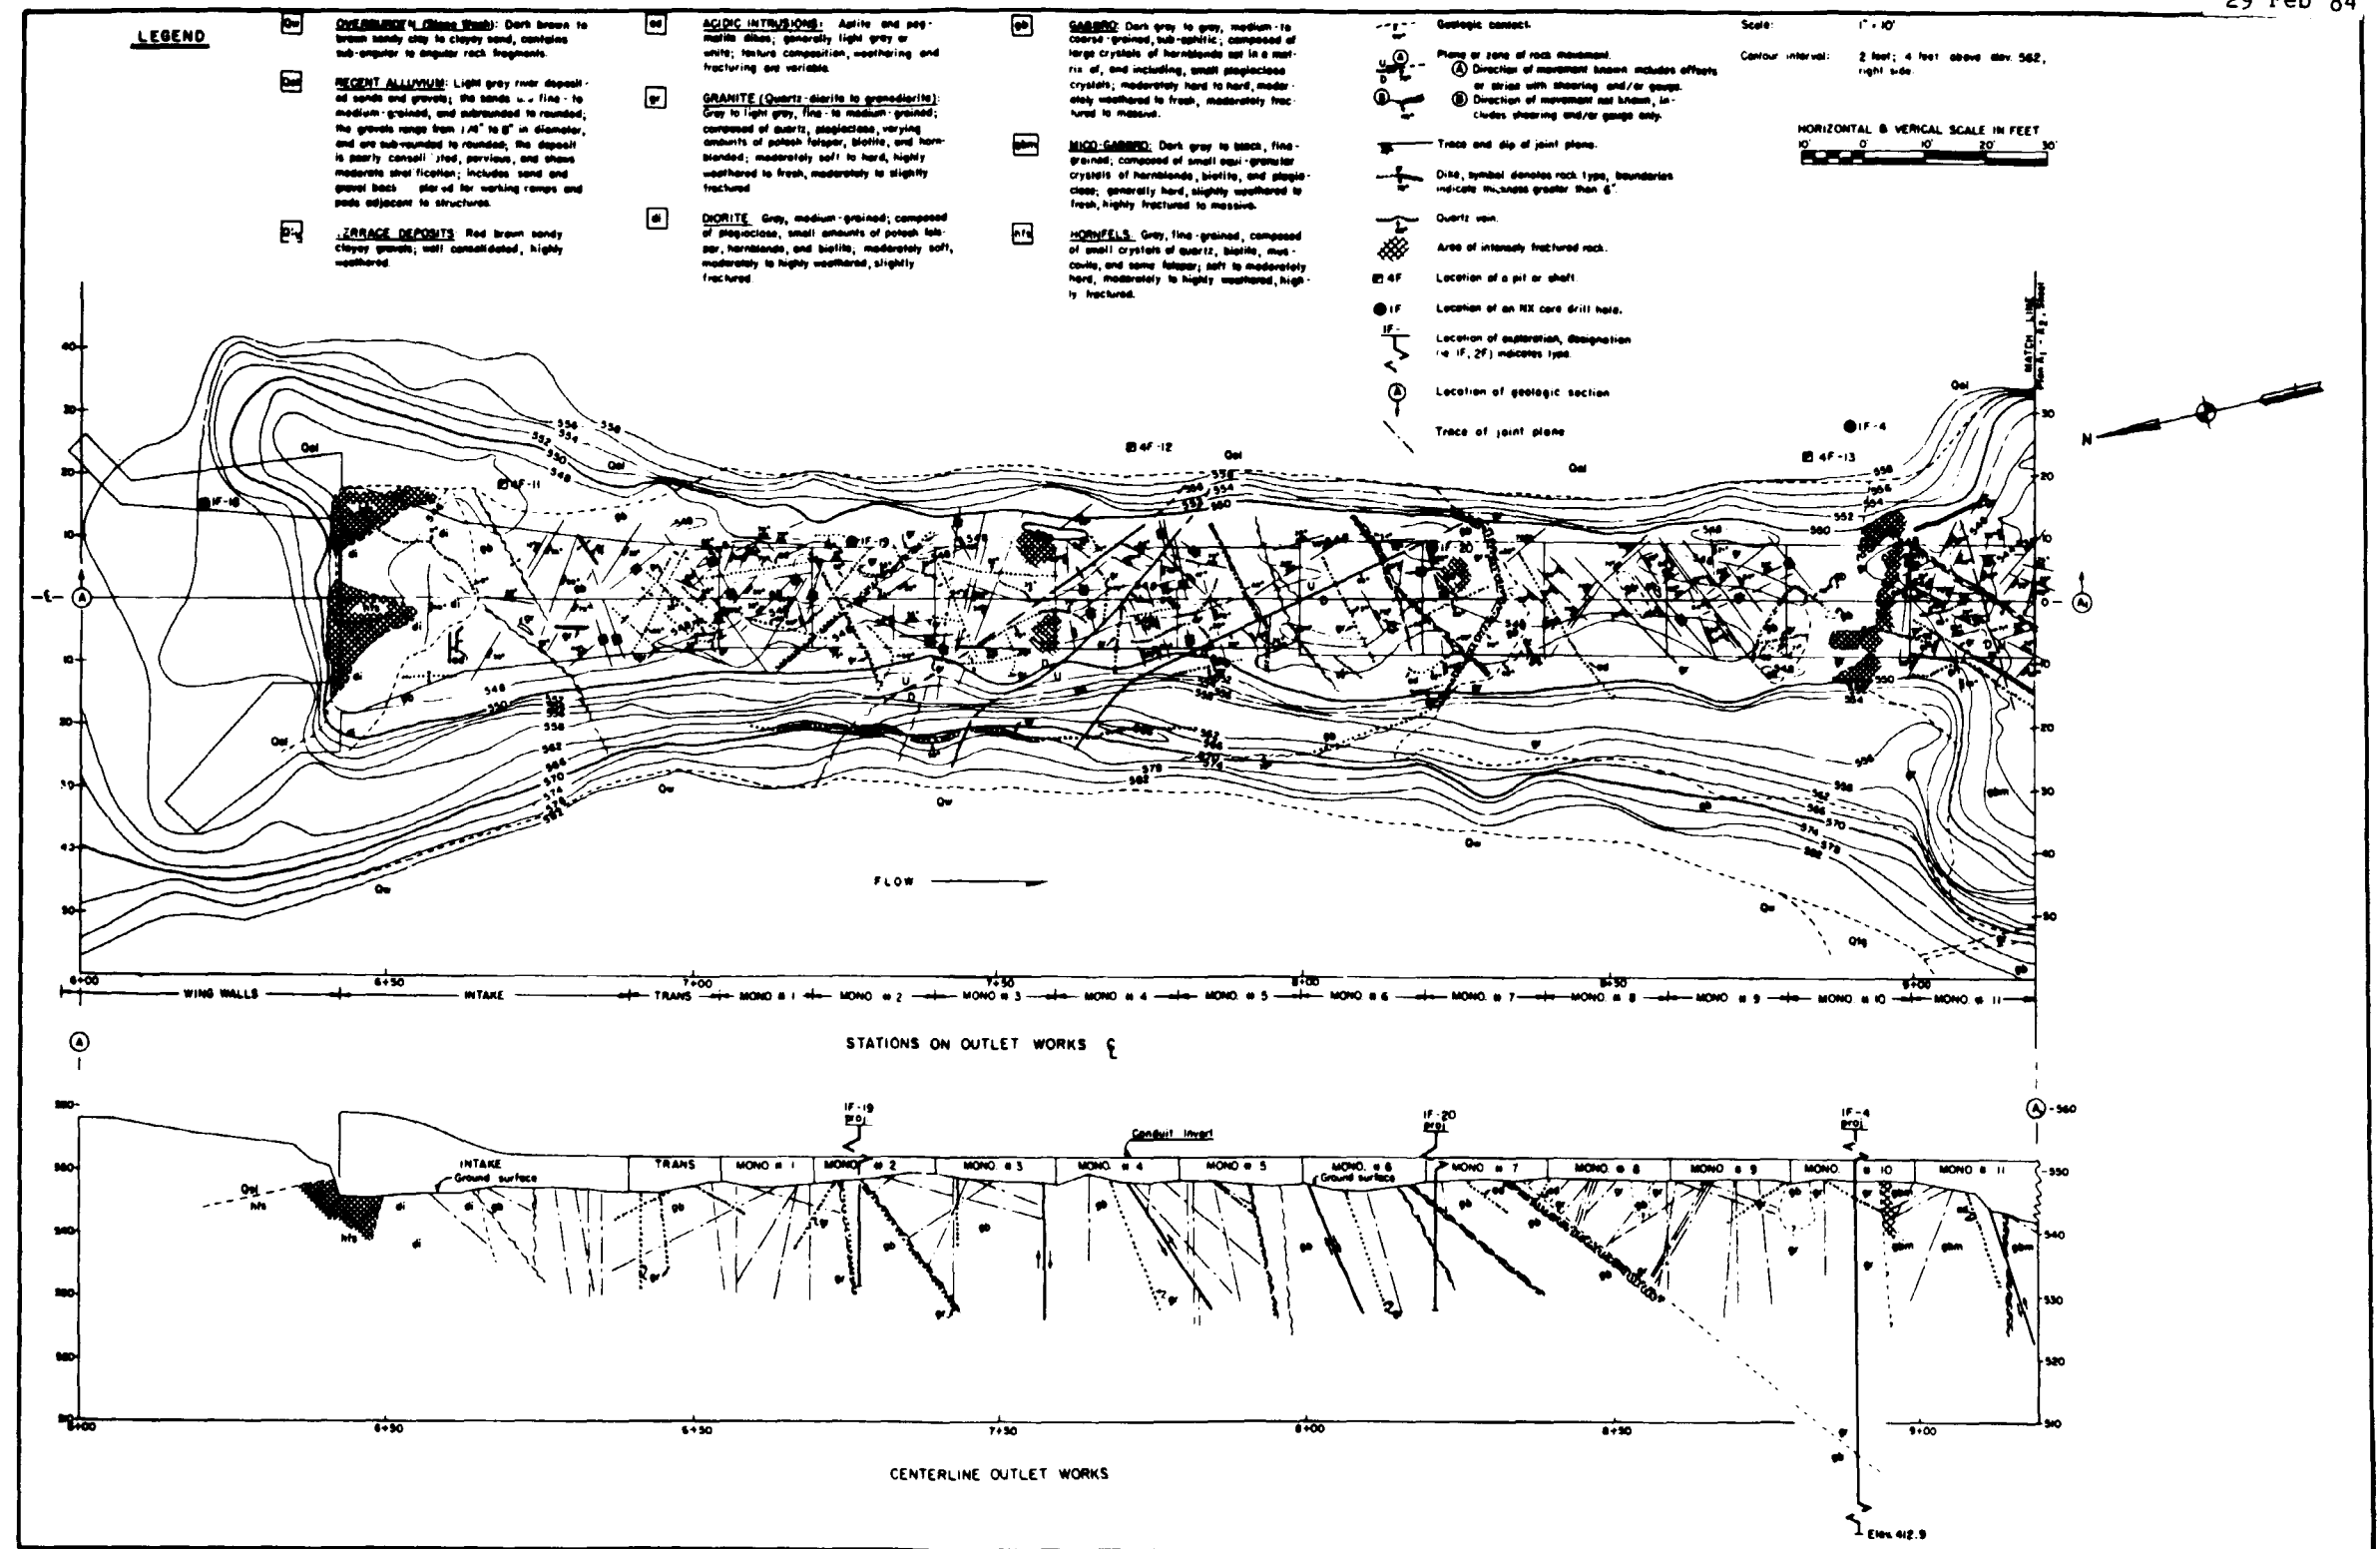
Foundation map for concrete structure on metavolcanic and igneous rocks
